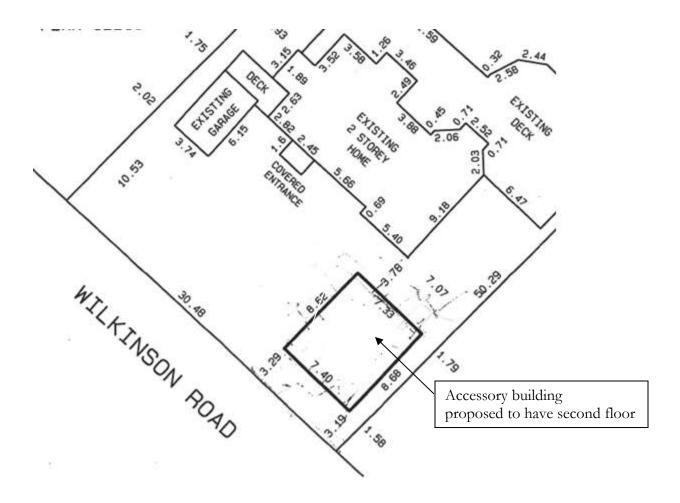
Site Plan Illustrating Size and Setbacks of the Accessory Building which the Applicants are seeking to add a Second Floor
